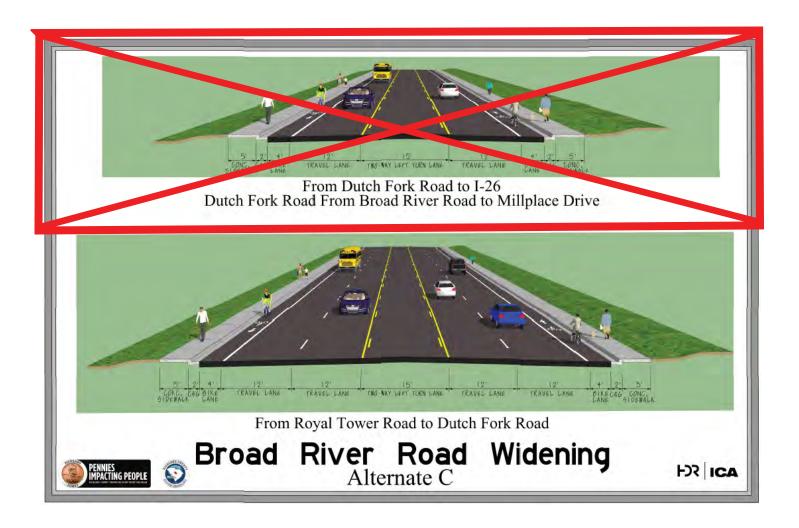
Exhibit C – Broad River Road (US 76) Widening Recommended Typical Section
